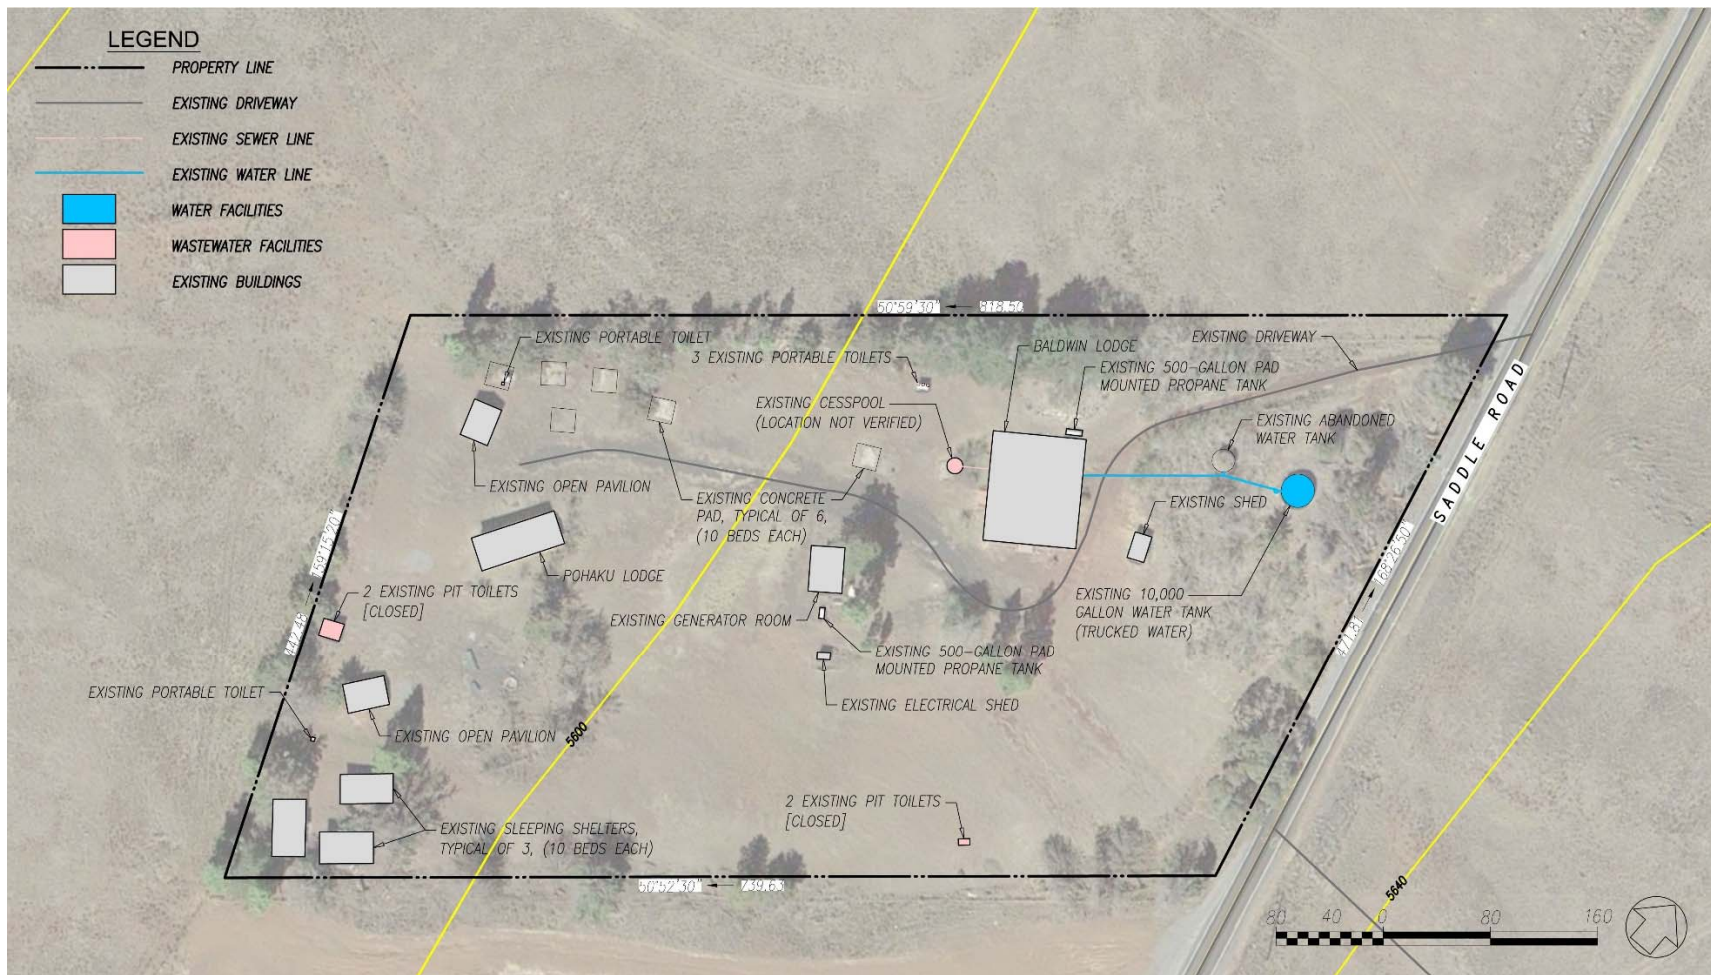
Existing site and utility plan (courtesy of G70, 2016).
